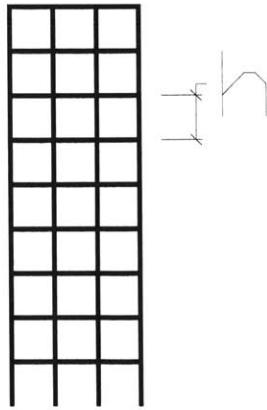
Proposed Structural Frame Floor-to-Floor Height
